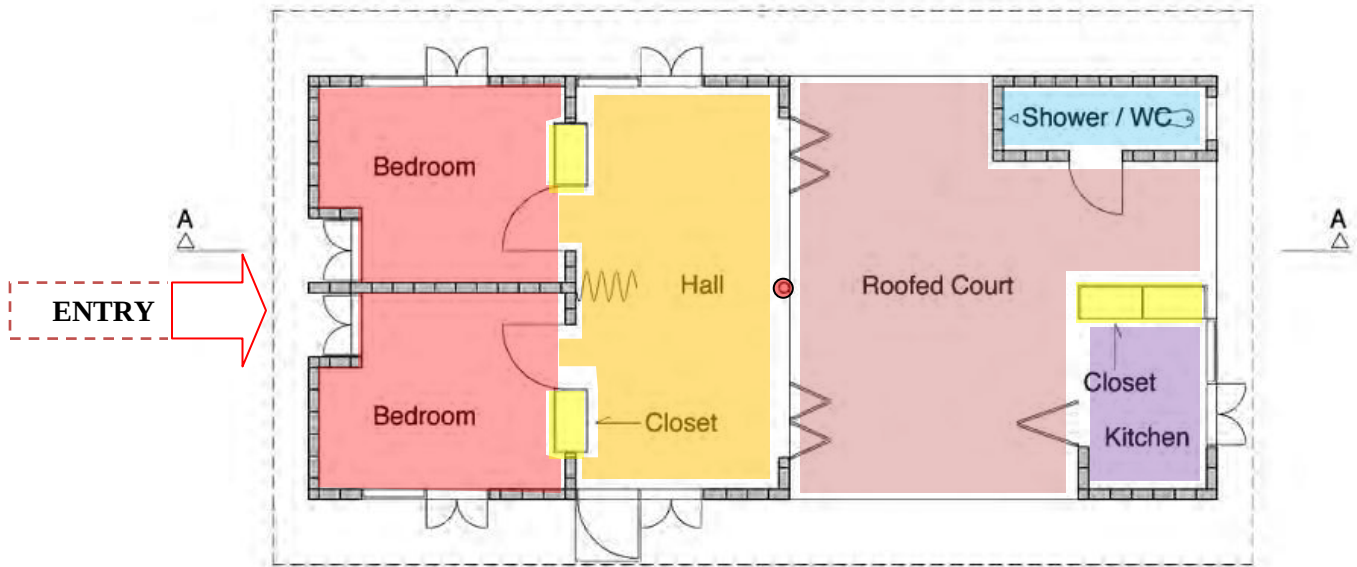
Plan of individual house units (Source: Sultan Barakat report, 2013; Rendering: Author)
